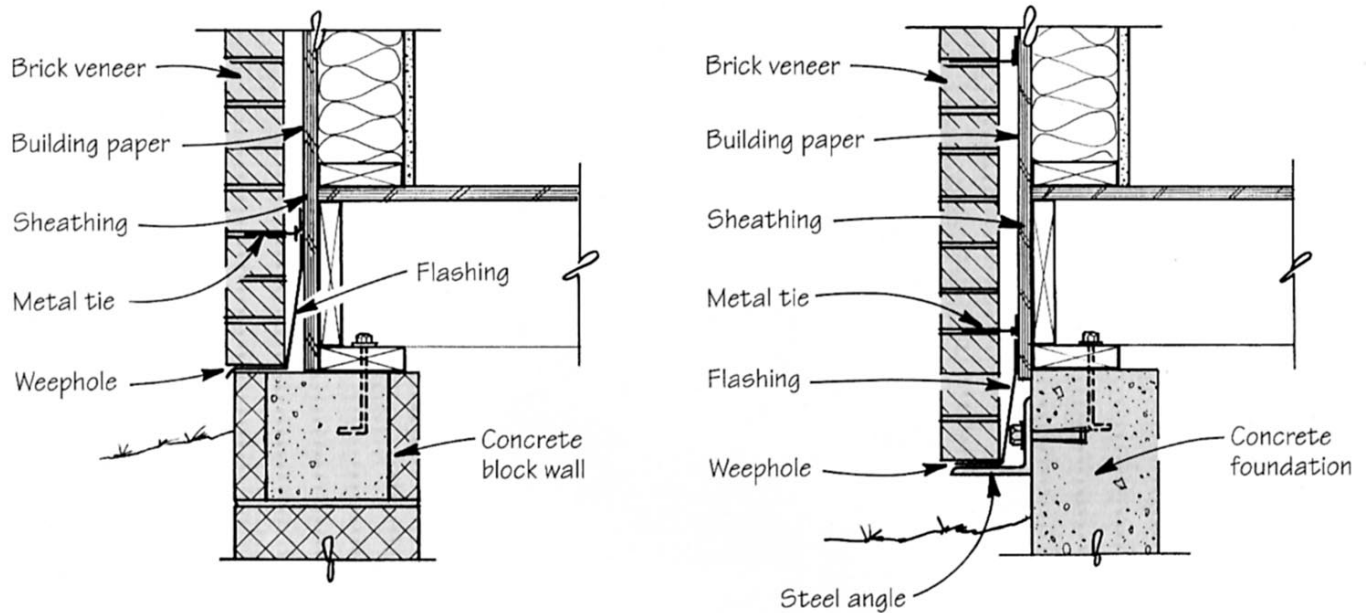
In new construction, foundation walls are poured or laid wide enough to provide a 4-inch shelf for the brick (left). A steel angle bolted onto an existing concrete foundation can support an add-on brick veneer wall up to 14 feet high (right). The steel shelf should be installed above grade.
